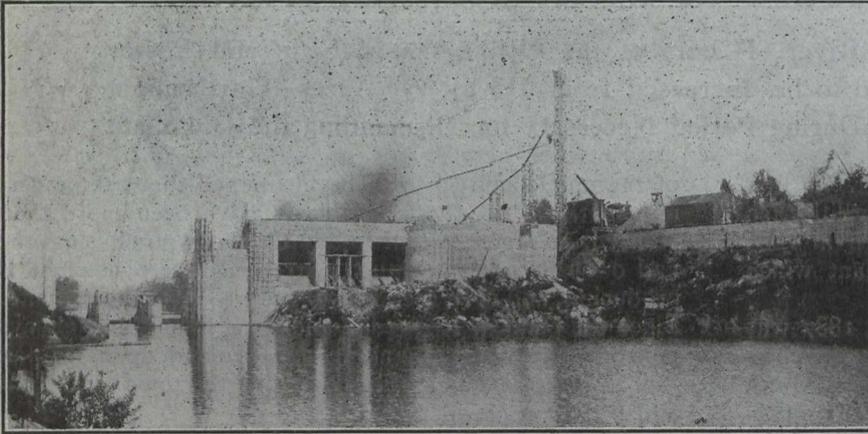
View Taken Looking Downstream, Showing Wheel-pit House, Entrance to Canal and Dam Partly Built
